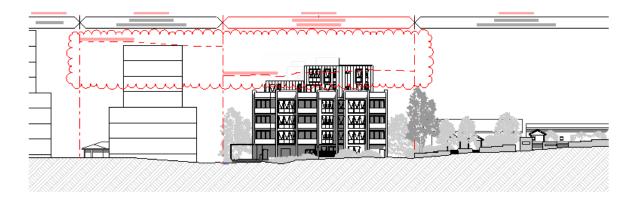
Streetscape elevation showing potential future development to the south of subject site having higher height limit, the proposed building will provide a transition between the differing height zones.
